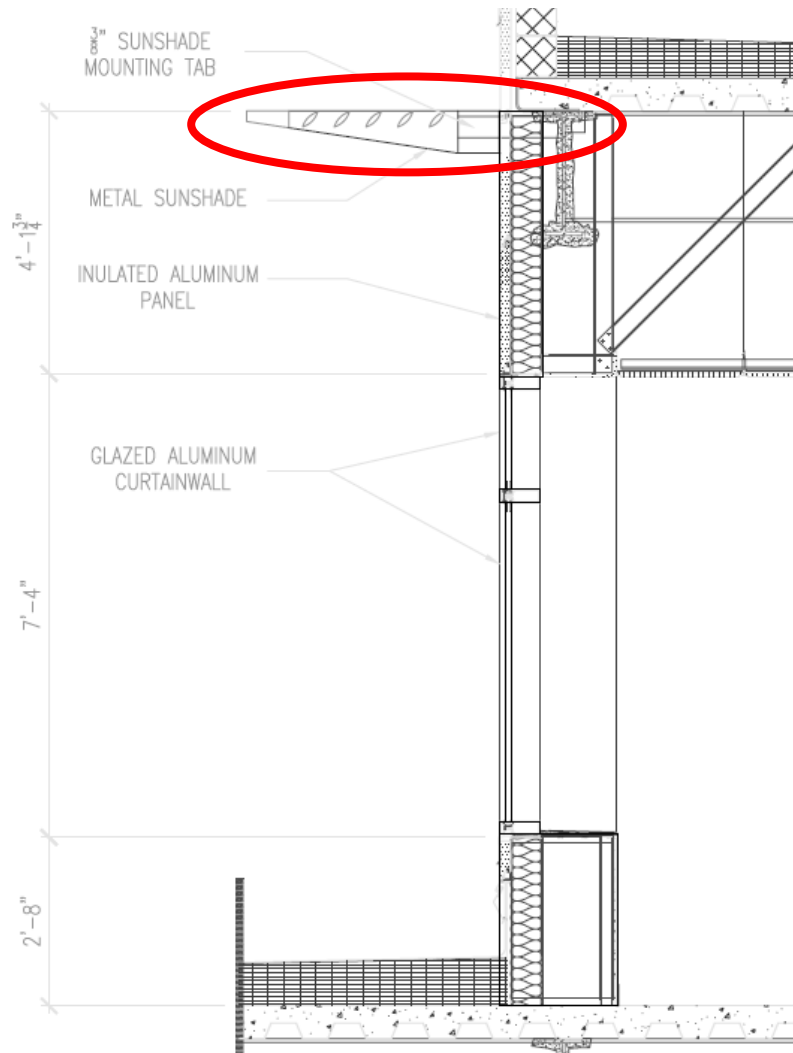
Existing Wall Section of 5<sup>th</sup> Floor
